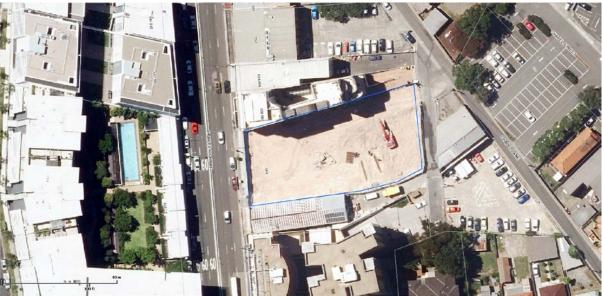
Aerial view of site (highlighted in blue & shown to be under construction)
